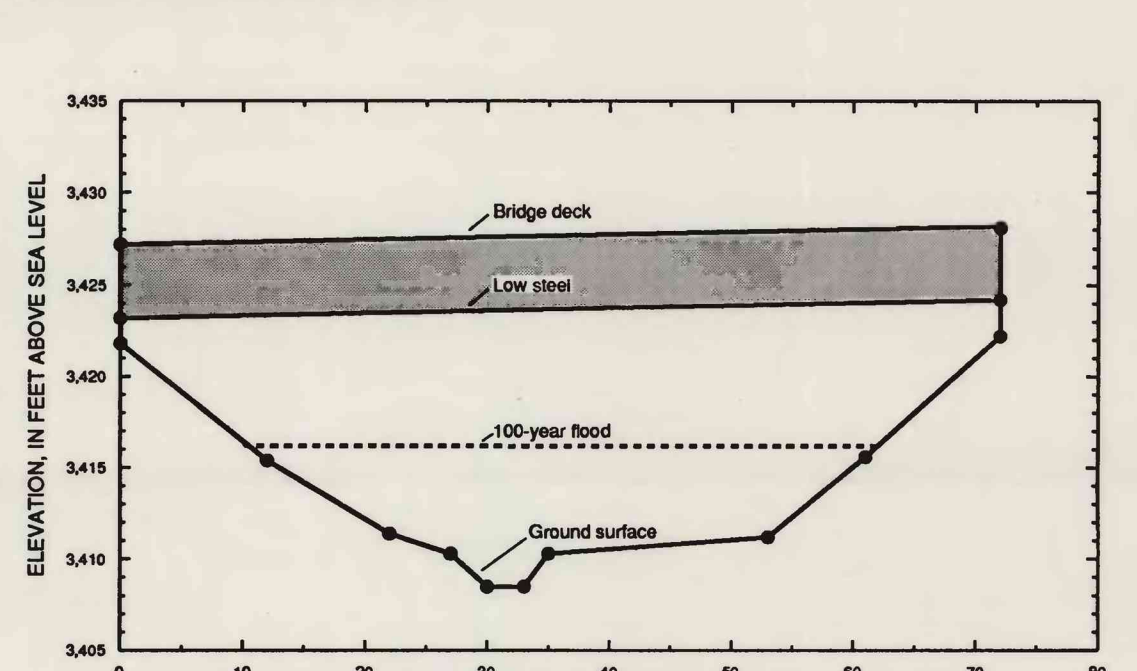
Cross section 90, which is a typical bridge crossing in the study reach.
